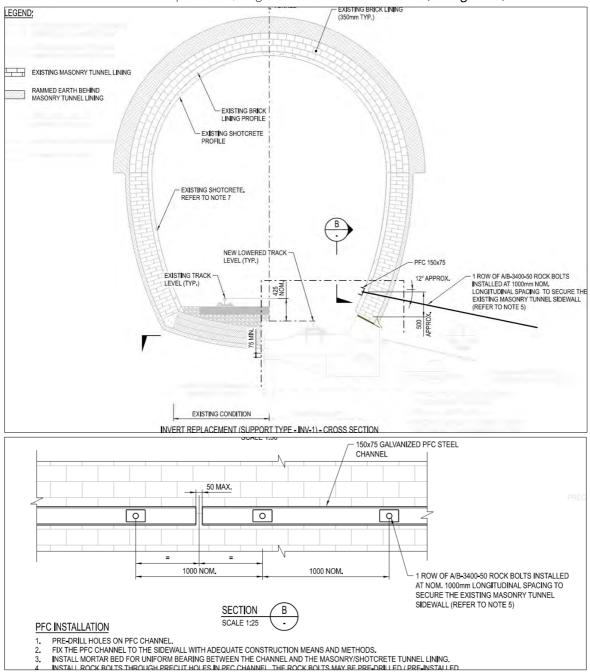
TYPE INV-1 CROSS SECTION OF TUNNEL (TOP) AND ELEVATION (BOTTOM) DEAILS SHOWING PFC INSTALLATION AND ROCK BOLT SUPPORT TO TUNNEL LINING. (SOURCE: AURECON/VLINE)
